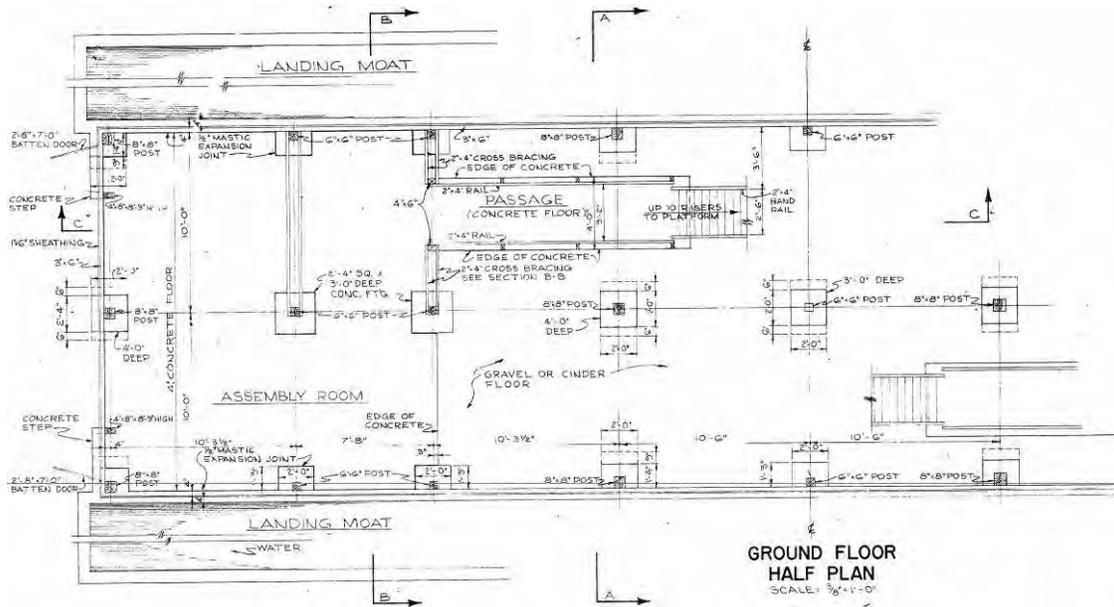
Abandon ship mock-up, ground floor half plan, Fort Bragg, NC, 1952 (standard drawing 28-13-98 sheet 1 of 3; abandon ship mock-up, plan and elevations; 20 June 1952).
